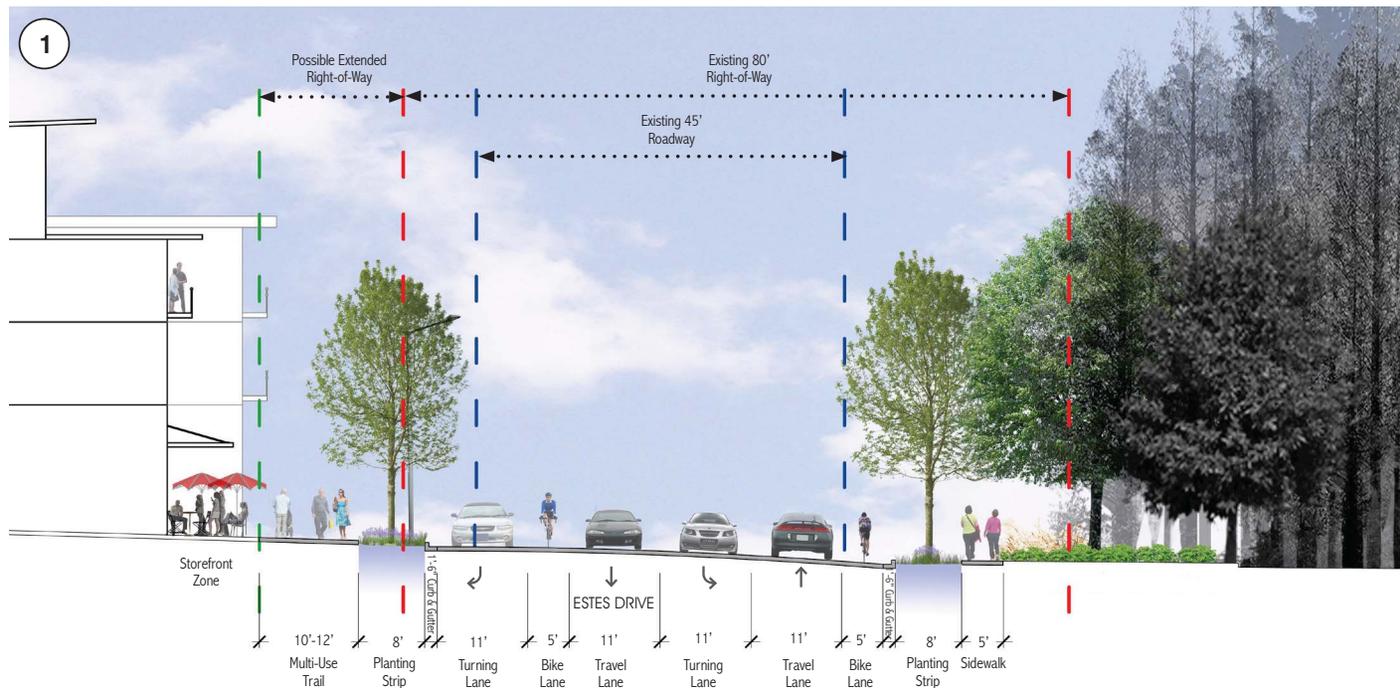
Estes Drive Cross-Section: Mixed Use Area (Looking East)
